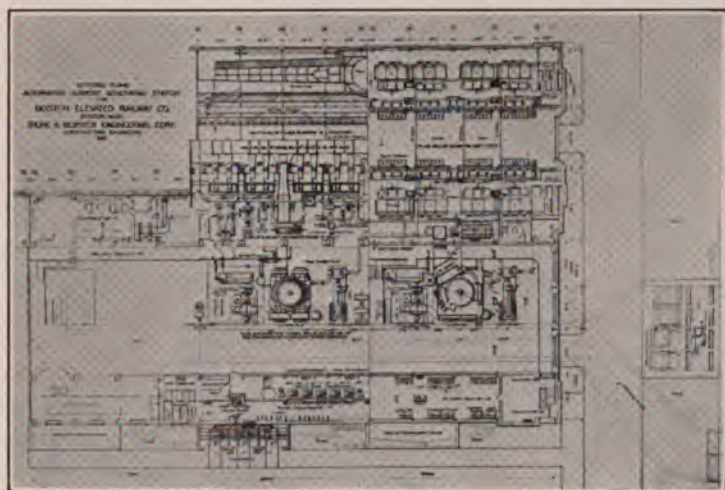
Plan of Boston Elevated Station, South Boston.
